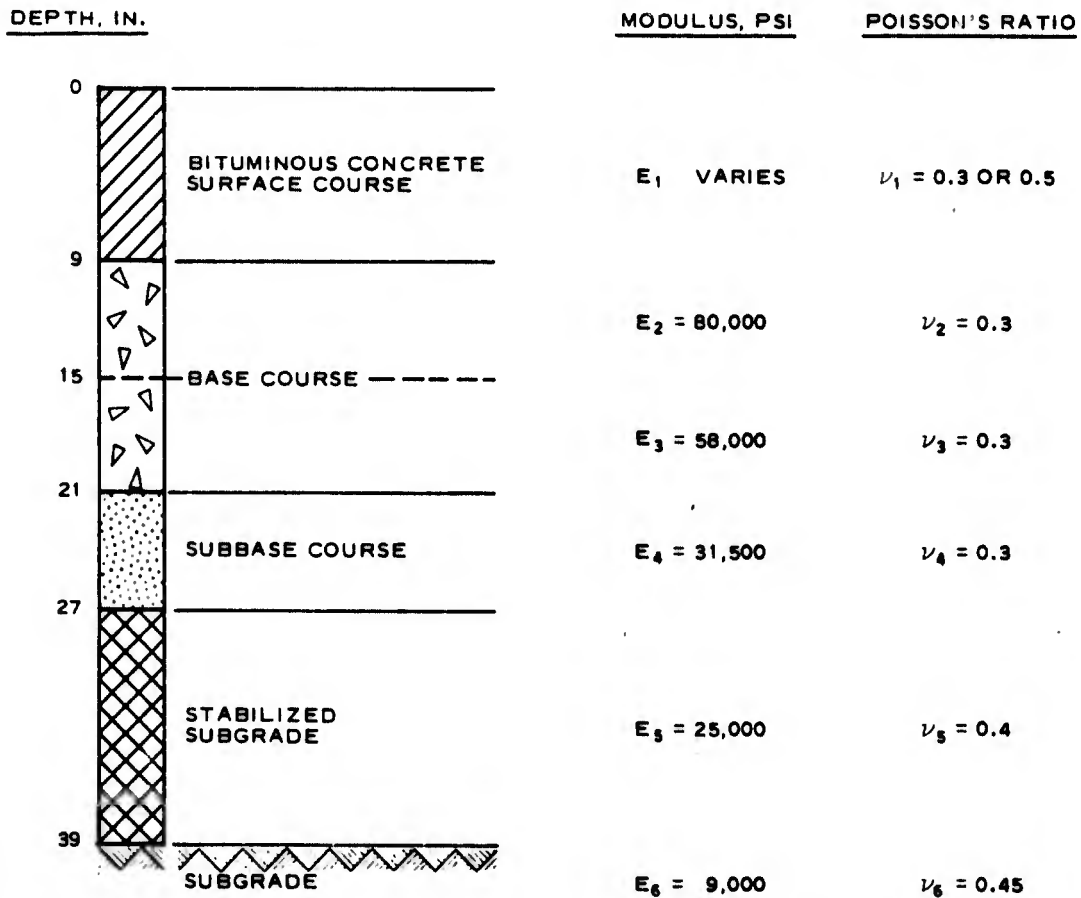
Estimated section for conventional flexible pavement with stabilized subgrade
